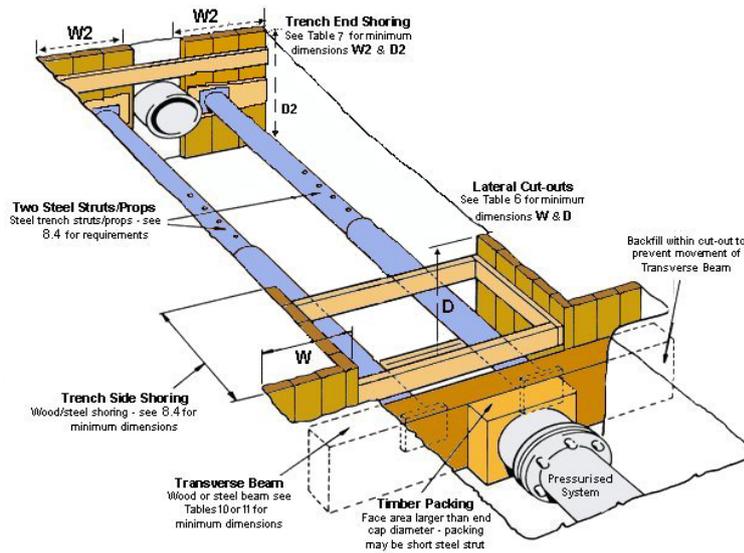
System 3 - Anchorage up to 60 kN - Allowing Trench Access
